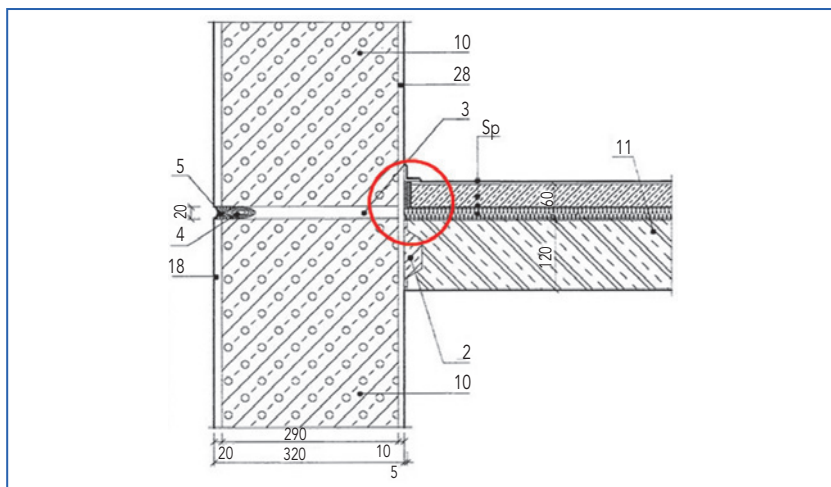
Detail of floor junction in T06B-KE system, [9].
